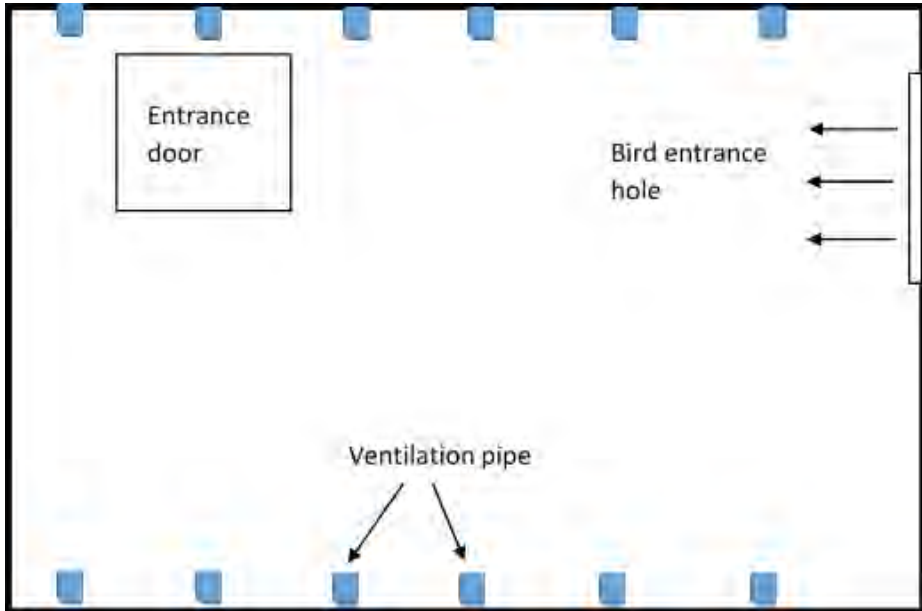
Top view of Floor Plan inside eKasih swiftlet house
